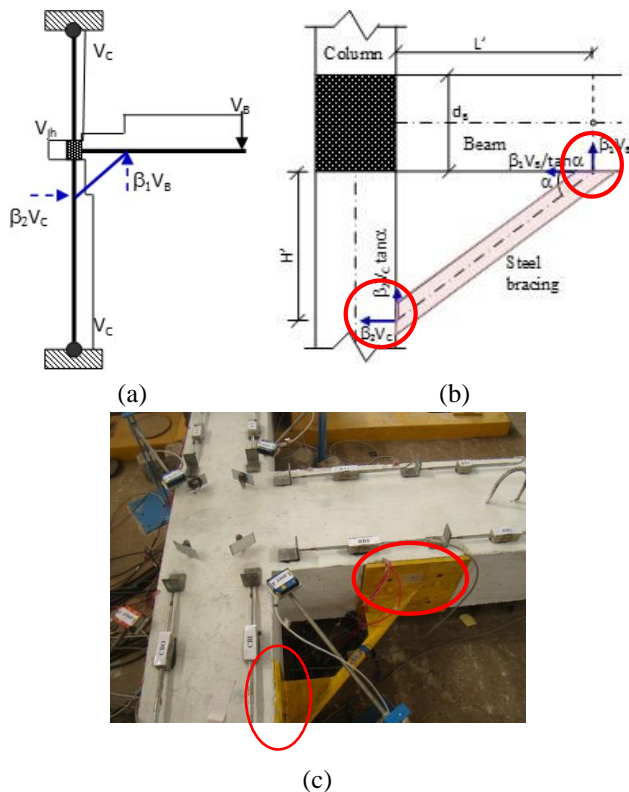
Structural arrangement (a) Re-distribution of force by adopting steel bracing, (b) force distribution at strut connection, (c) anchored retrofit scheme with RC structure
